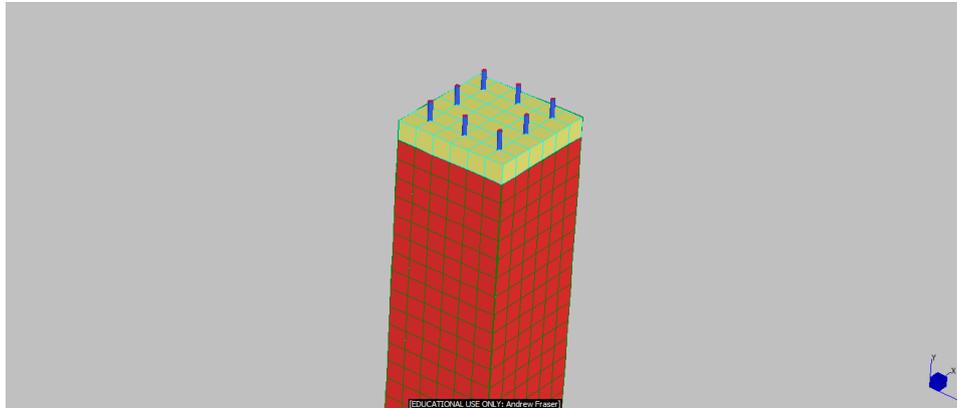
Reinforced Concrete Column with Wrapped in Steel Plate
